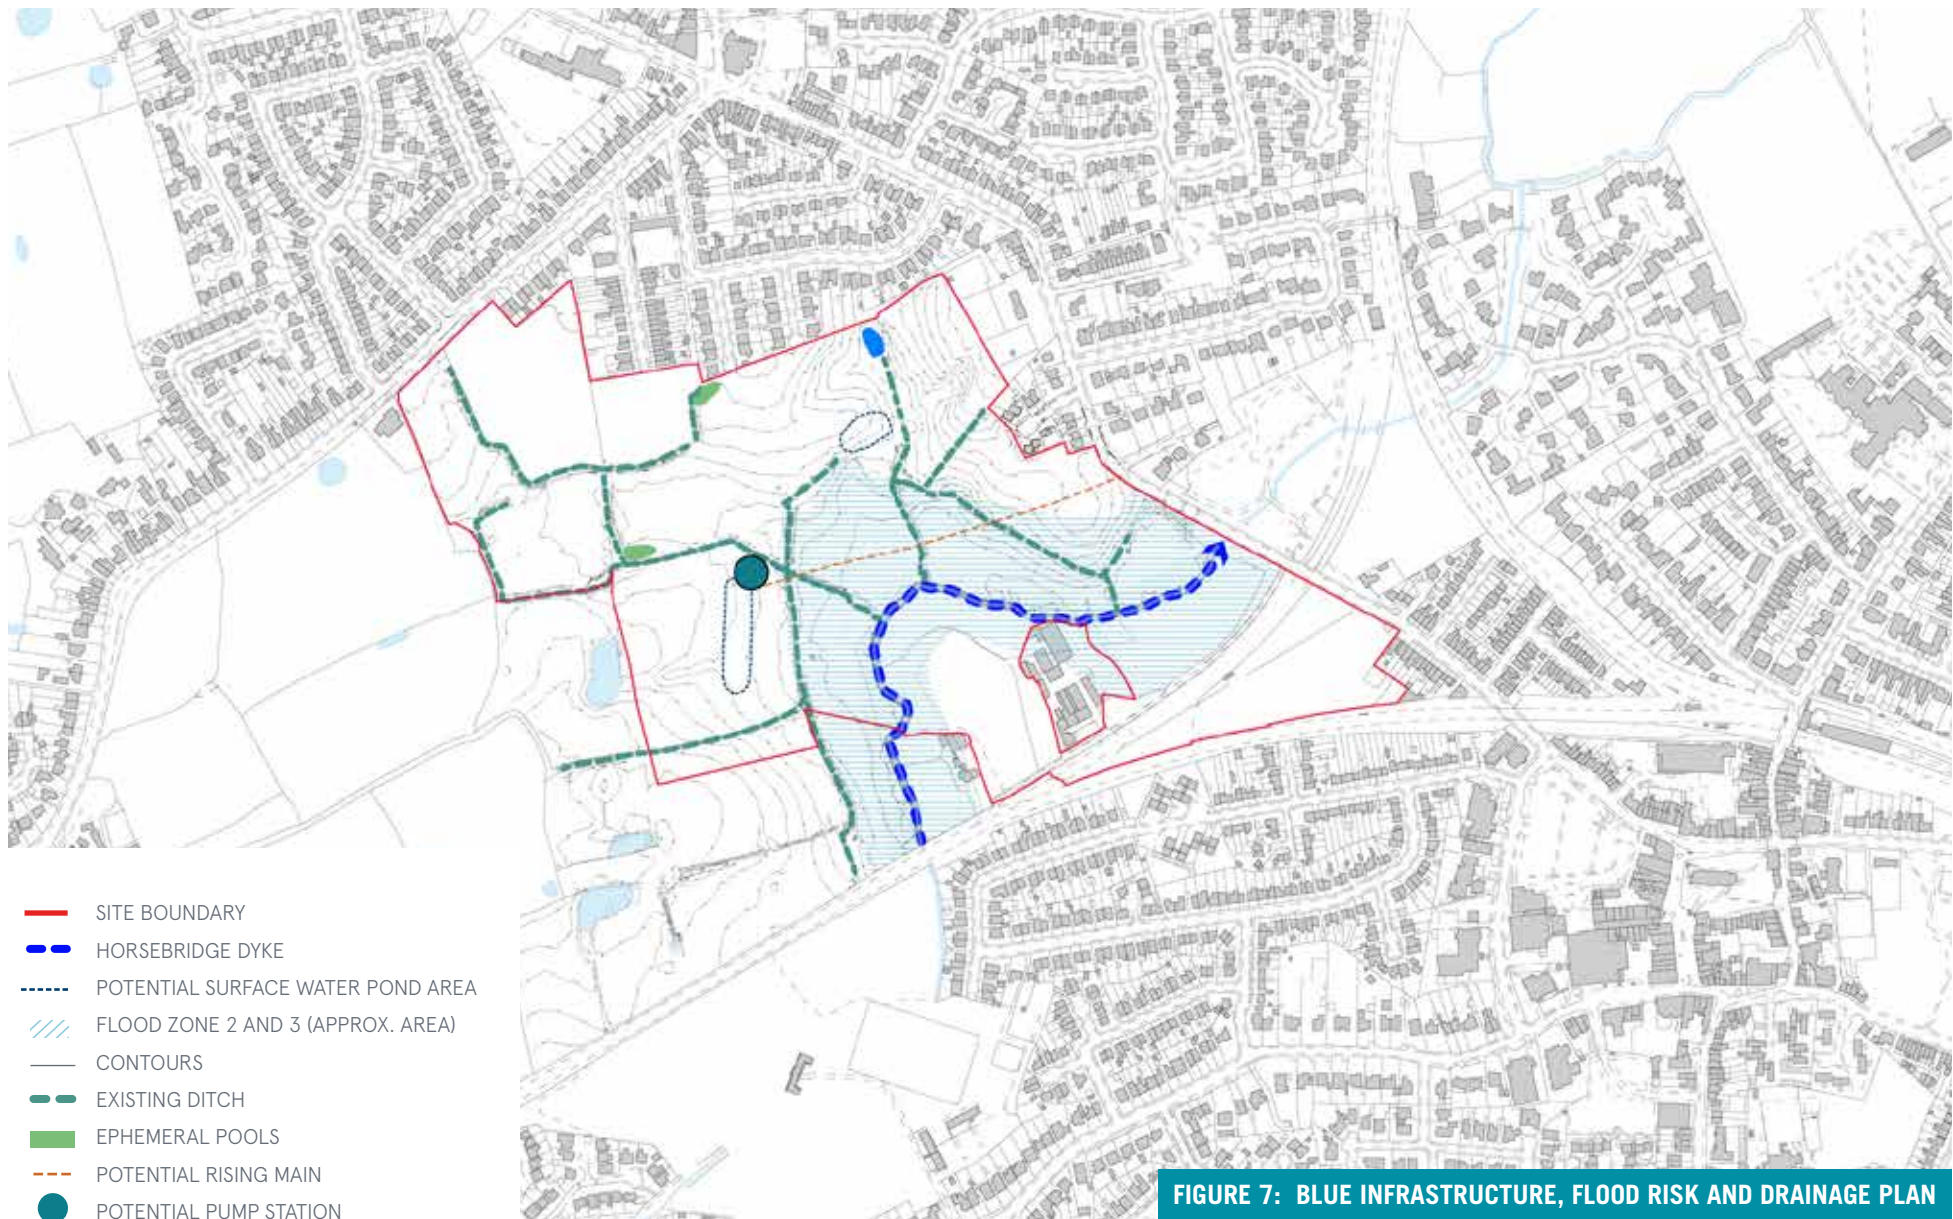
BLUE INFRASTRUCTURE, FLOOD RISK AND DRAINAGE PLAN
